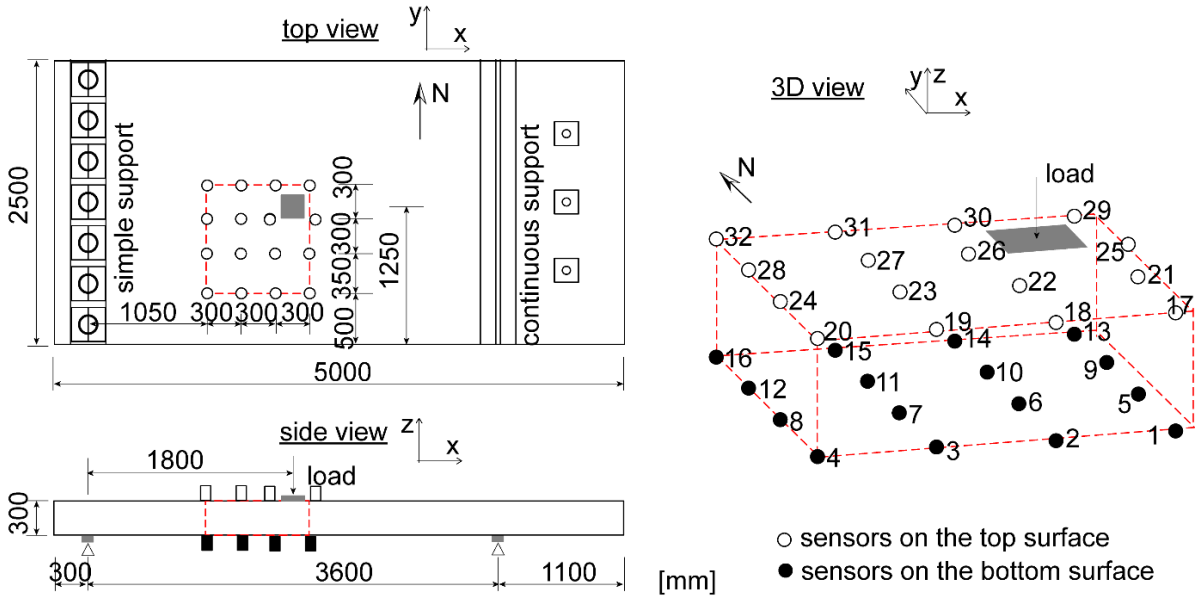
A sketch of slab configuration including slab dimension, AE sensor layout and locations of supports and load.
